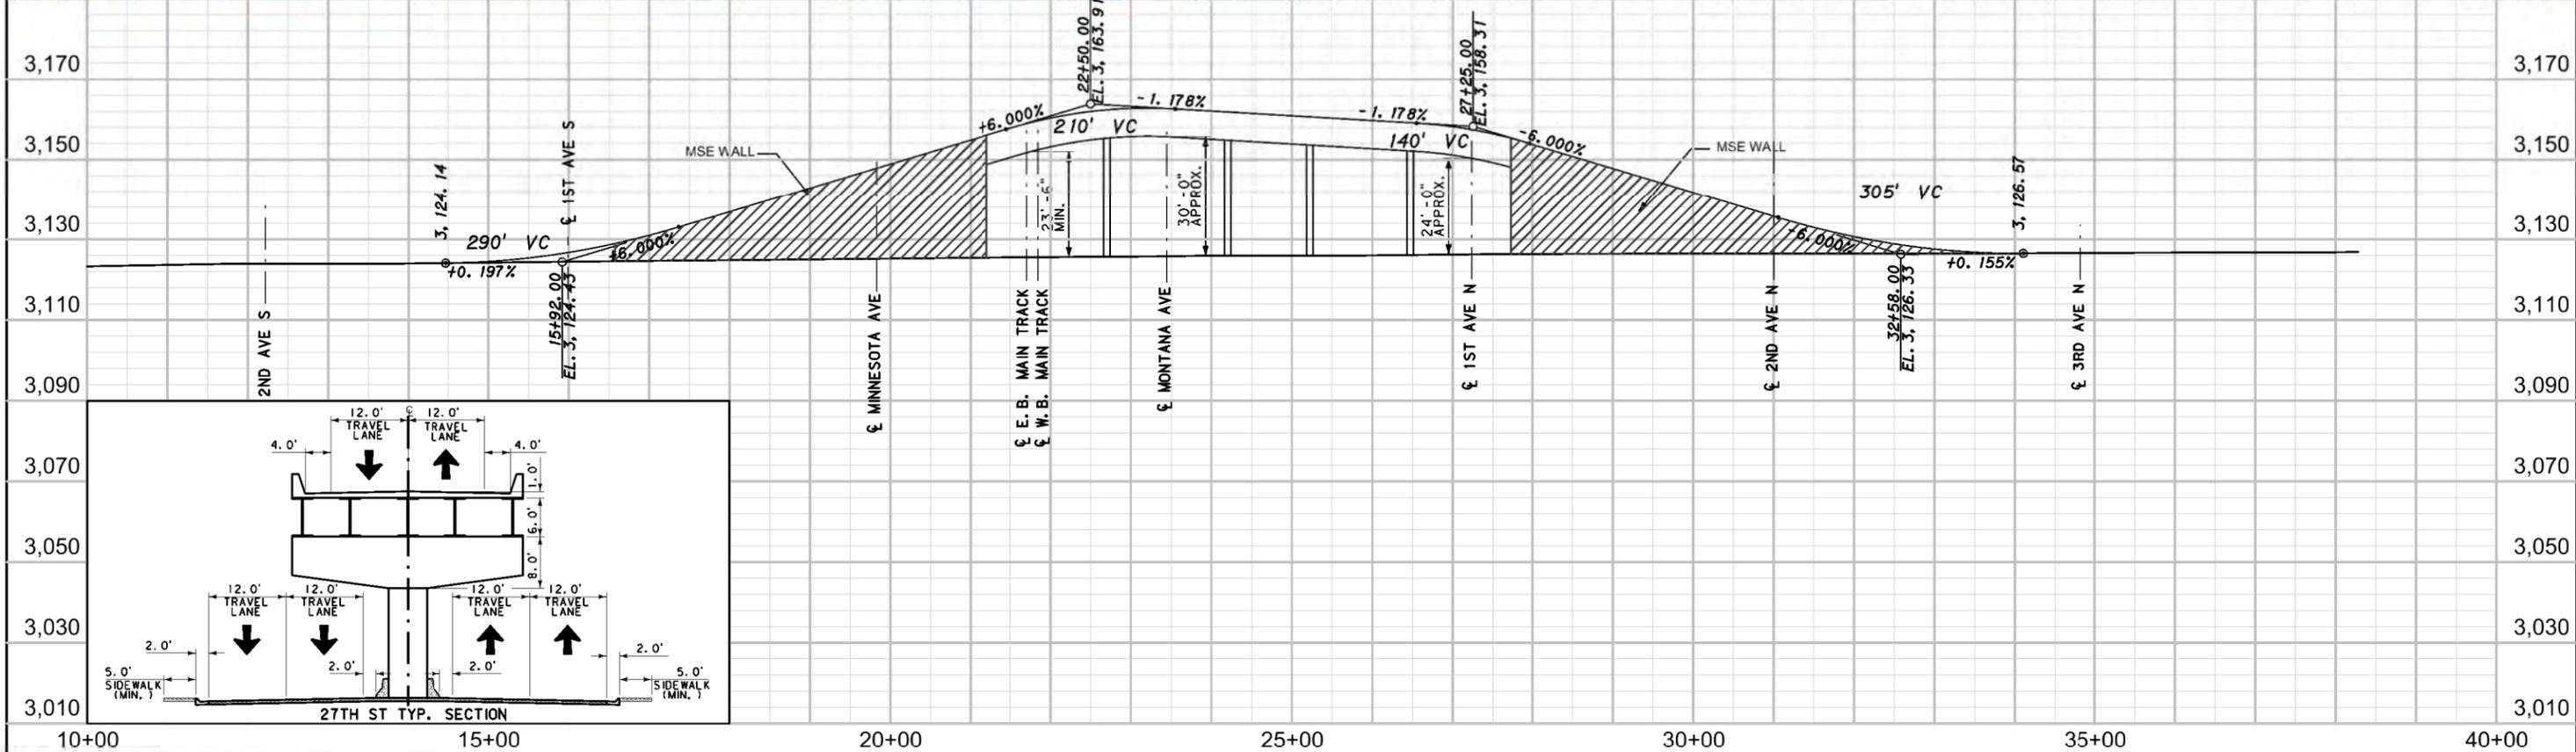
27th Street Overpass Conceptual Plan and Profile
